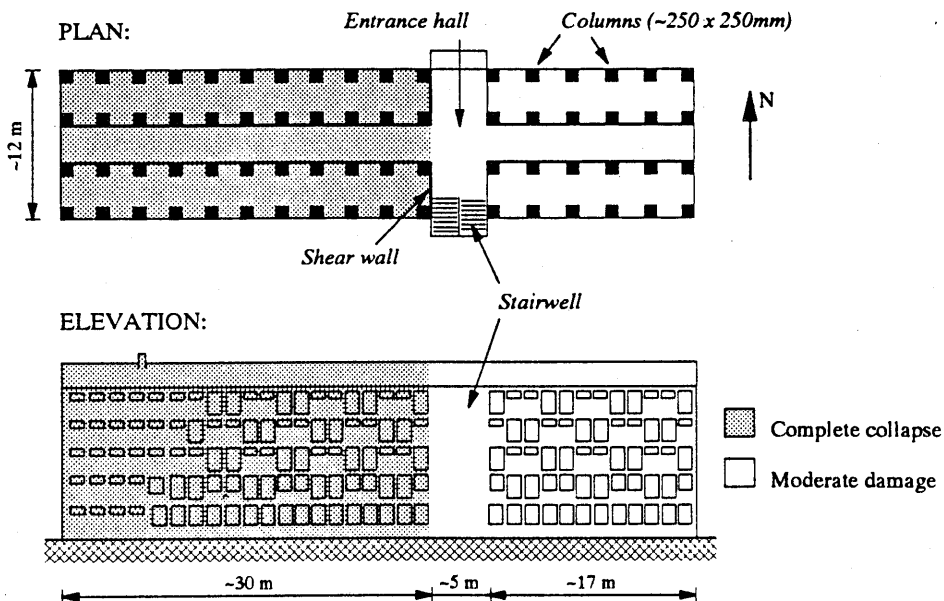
The Nursing School; Typical Floor Plan and Elevation Showing Distribution of Window Openings (not to scale)
